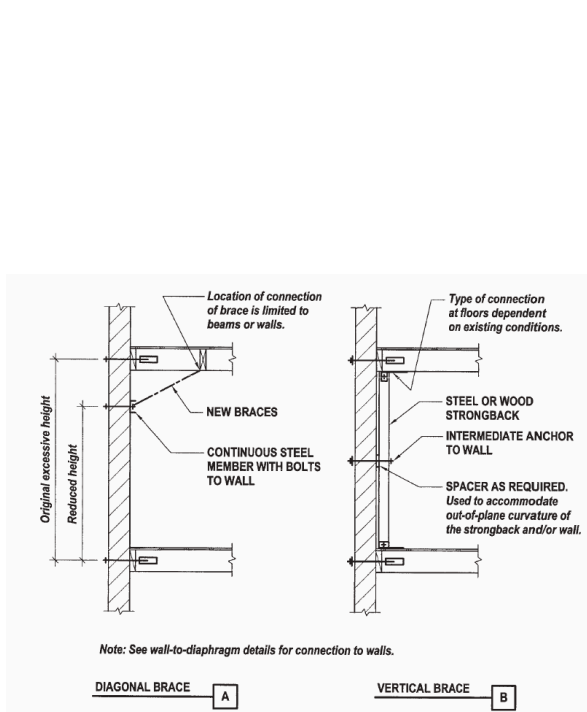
Exposed Out-of-Plane Wall Bracing
